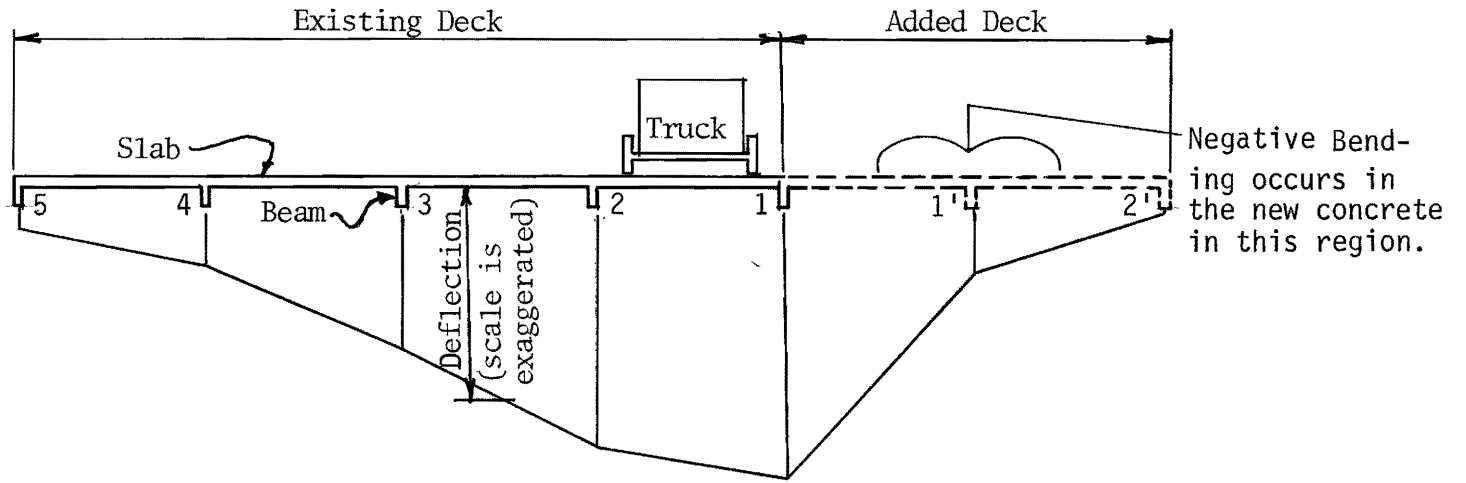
Deflection Pattern at a Transverse Section of a Bridge at Midspan.
